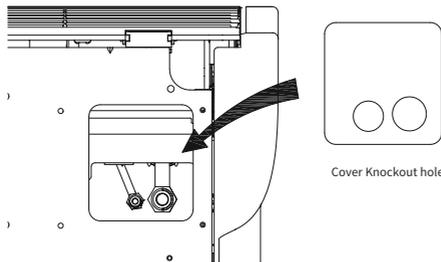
Electrical Wiring Connection for Indoor Unit
